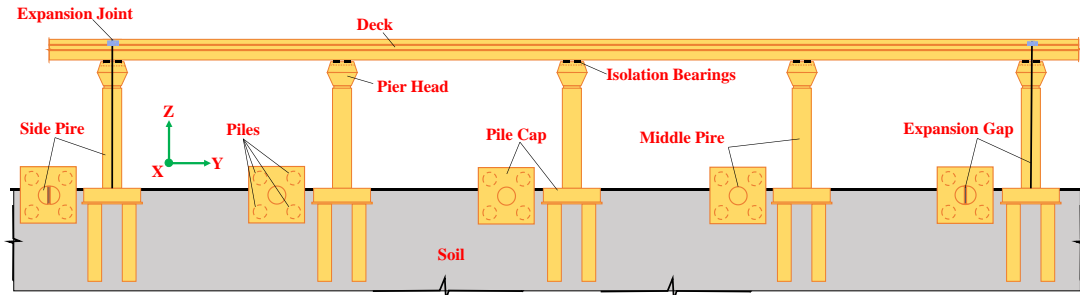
Typical single-pier isolated bridges with the pile foundation
